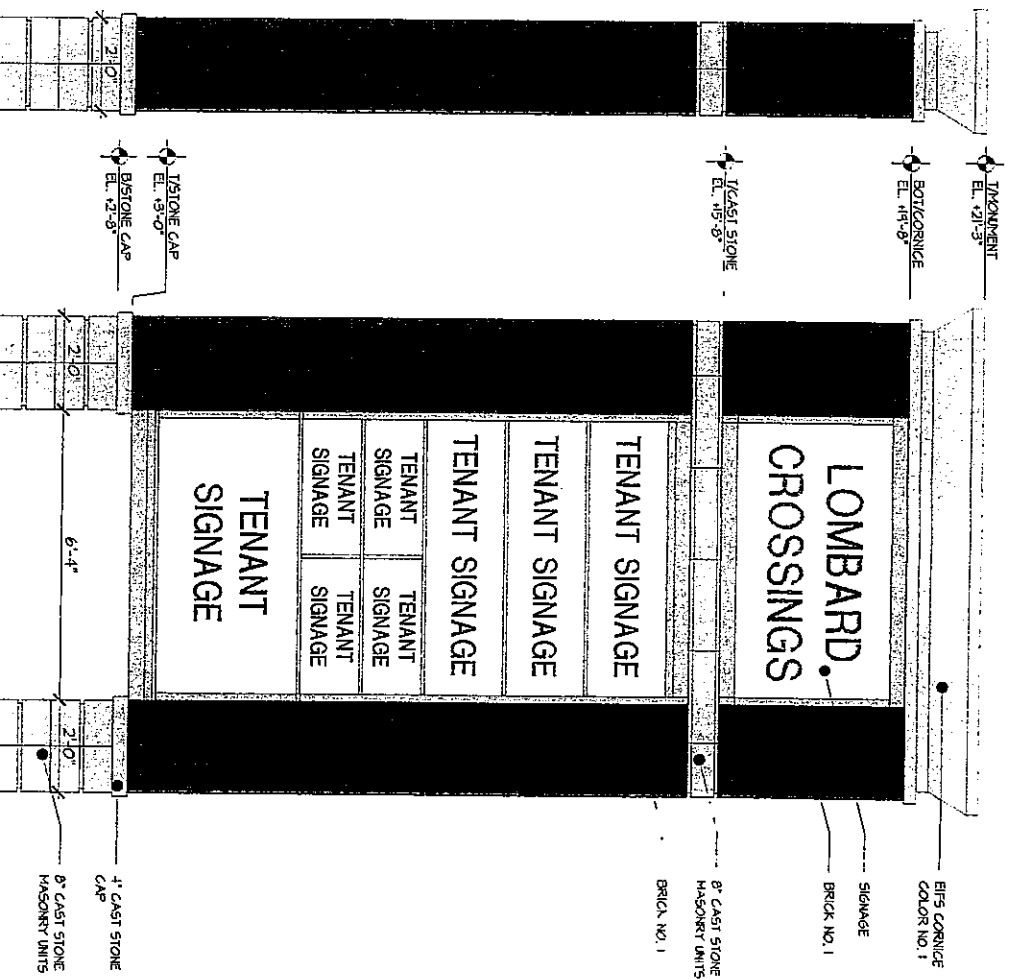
EXHIBIT H: PRELIMINARY SIGNAGE PLANS
